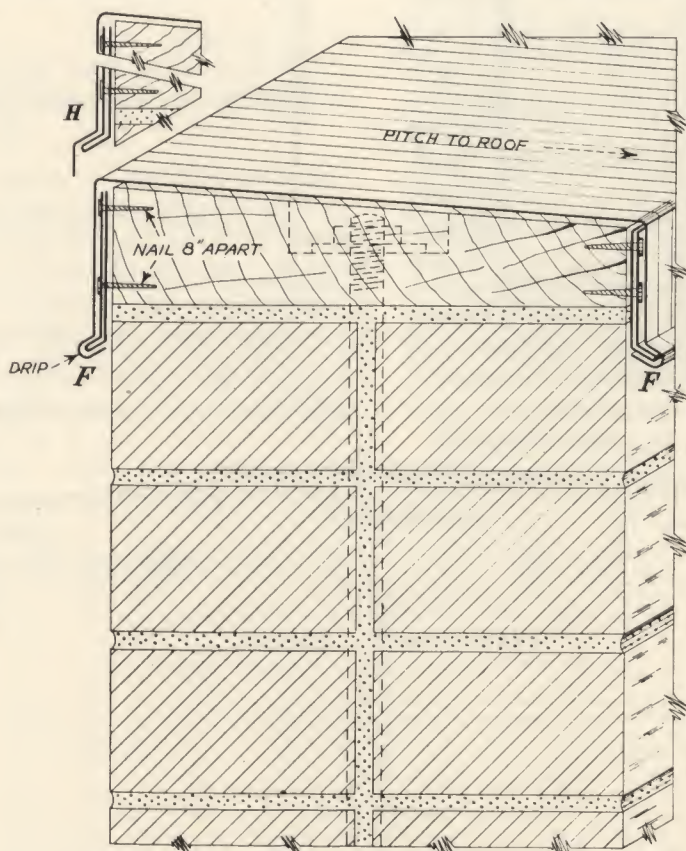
SHEET METAL COPING — ALTERNATE METHOD
